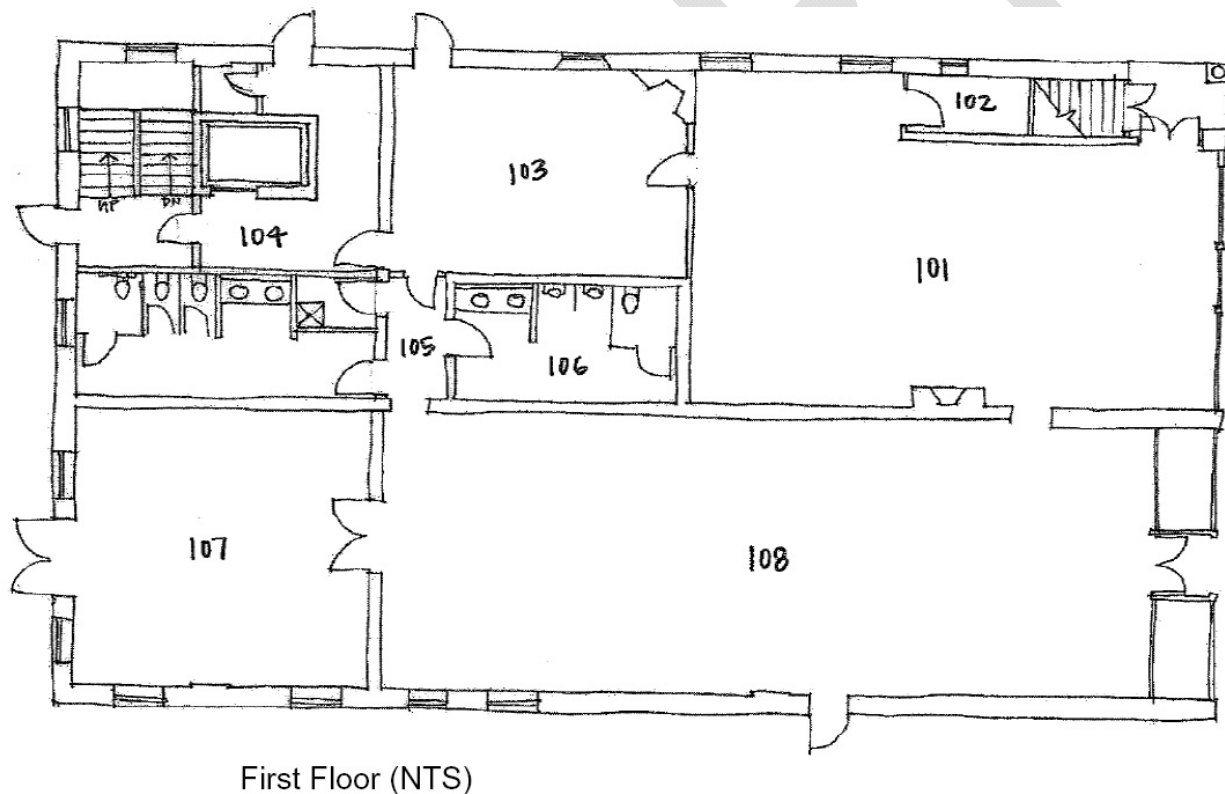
Existing Conditions, First Floor of Union Building (SmithGroup)
